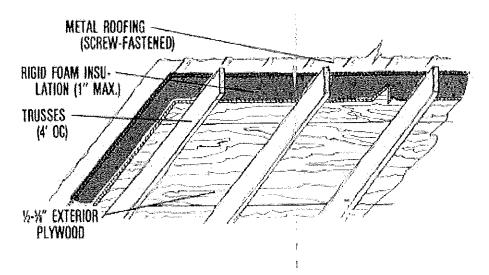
Fire-protected foam panels over trusses (R=5-10). Fire-protected foam panels over trusses utilize plywood sheathing instead of purlins for lateral roof strength. This is used for lightly-insulated livestock housing and for machinery storages.
